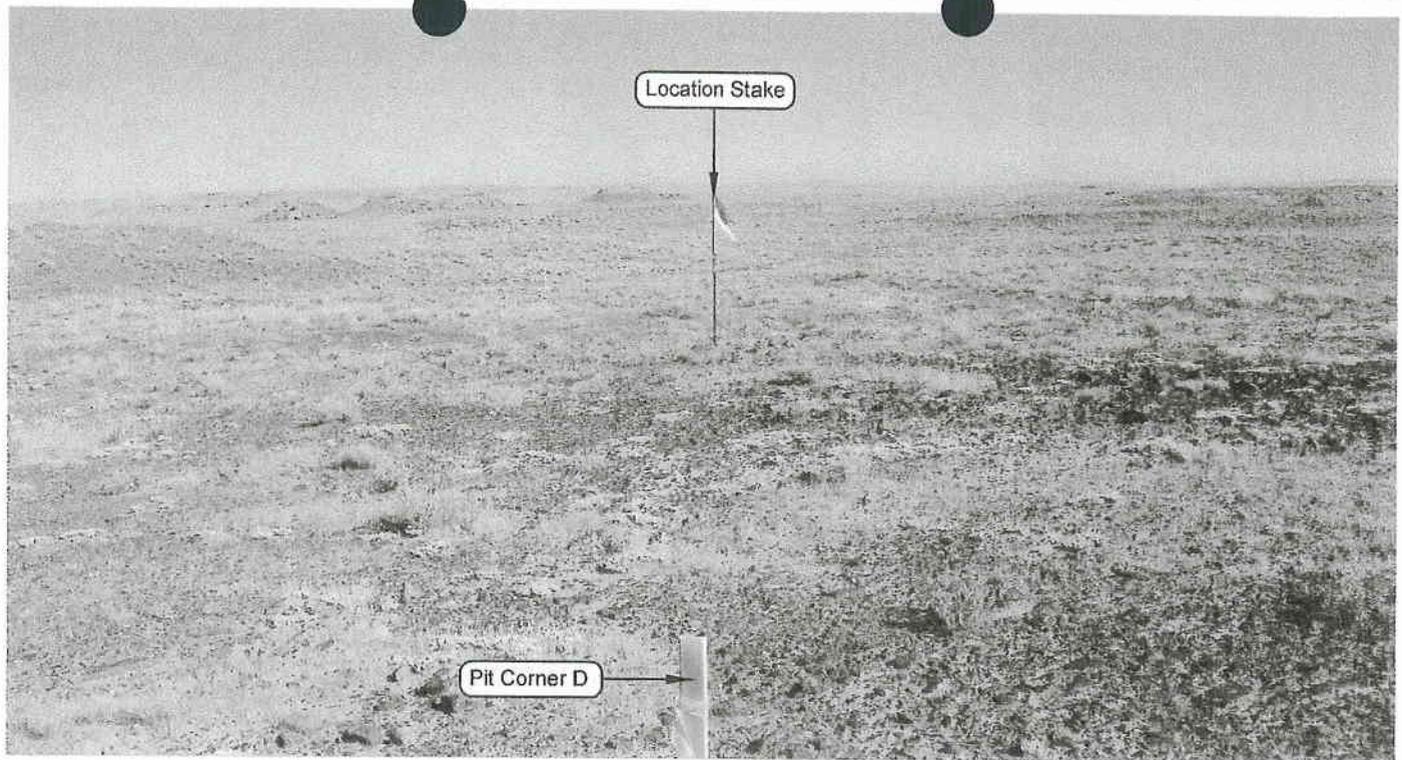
PHOTO VIEW: FROM PIT CORNER D TO LOCATION STAKE
